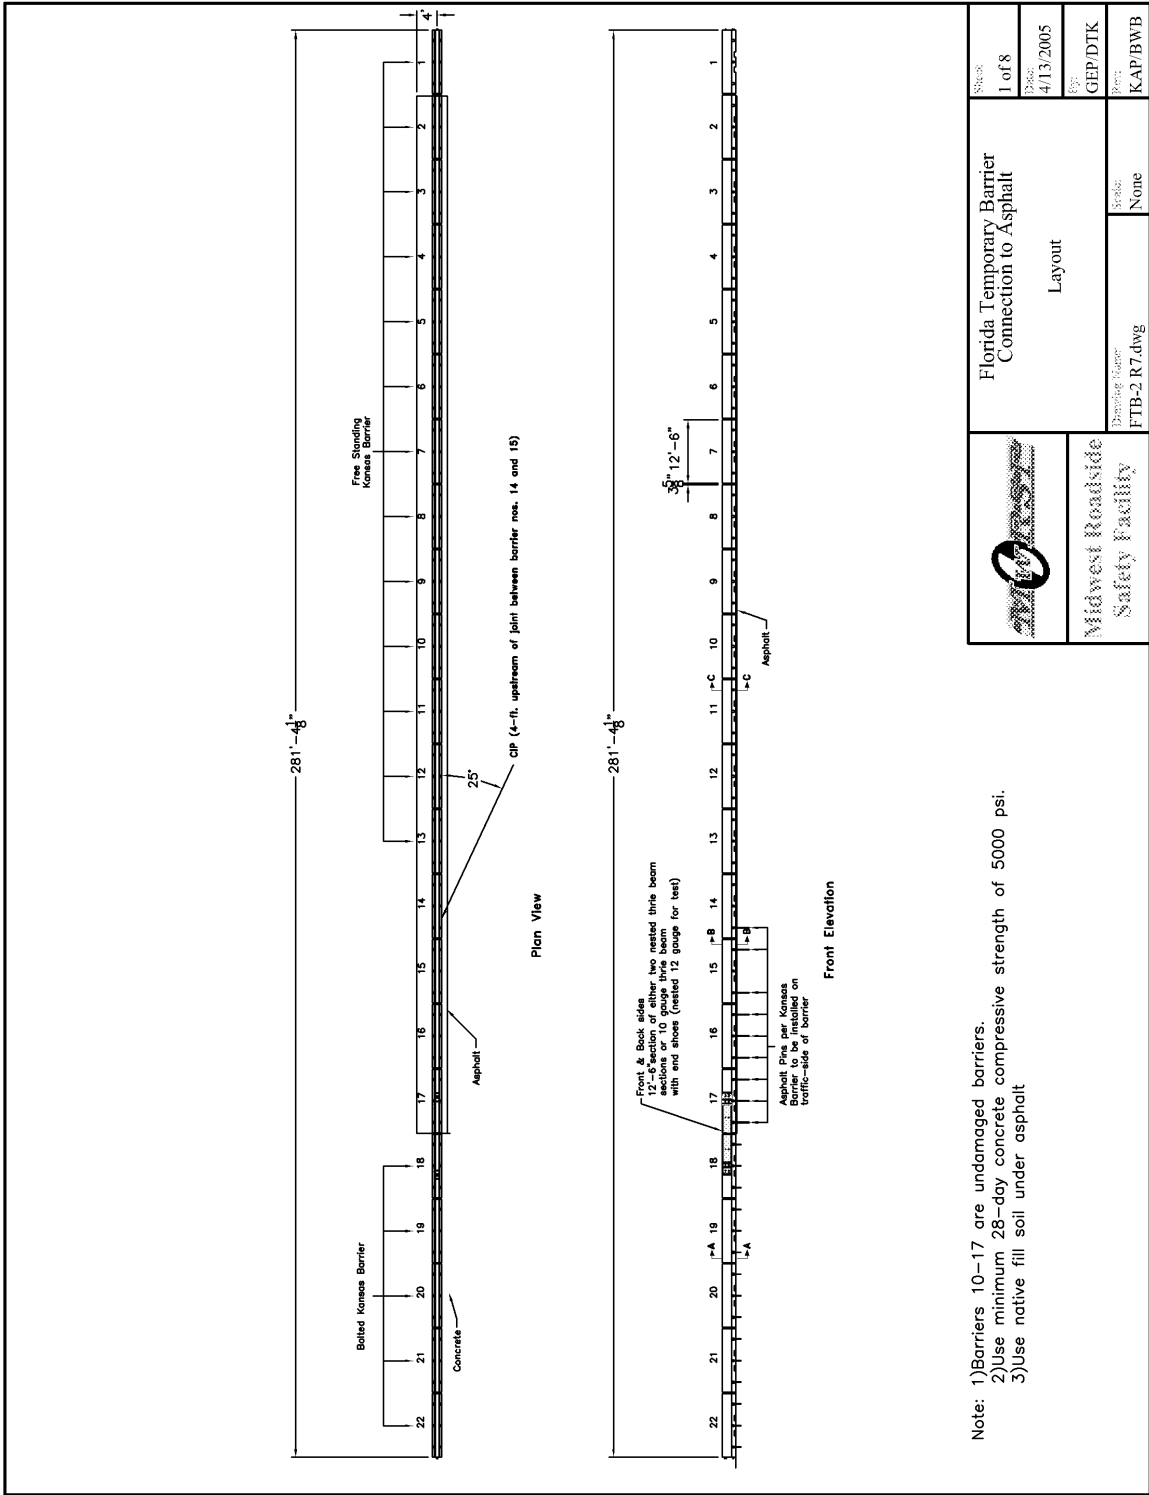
Free Standing to Rigid Barrier Transition Design Details
